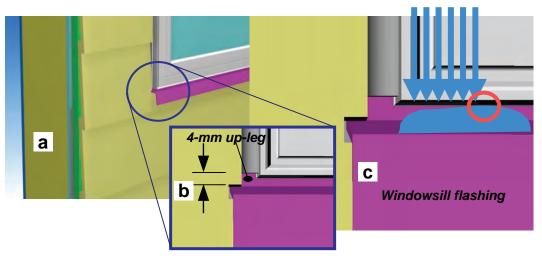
Variation-side of W3 and details of deficiency at (a) lower corner of window-cladding interface; (b) details of windowsill flashing showing 4-mm up-leg and; (c) water accumulation at windowsill flashing.
